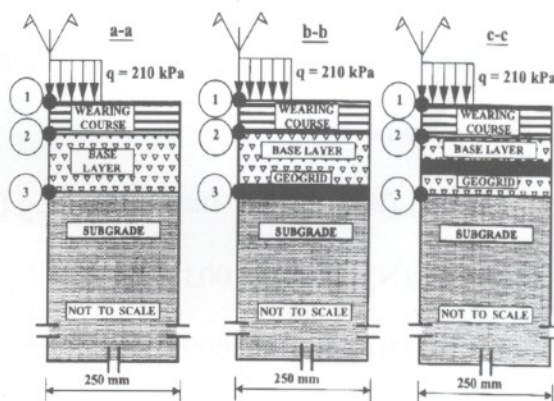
Cross-sections with specified recorded points 1, 2, and 3 in unreinforced and reinforced sections a-a, b-b and c-c
